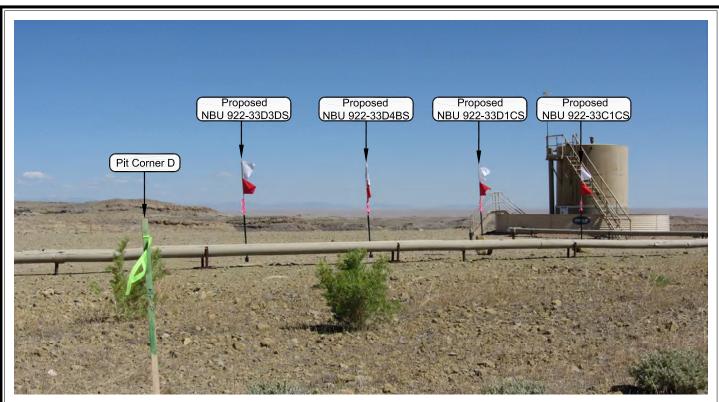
PHOTO VIEW: FROM PIT CORNER D TO LOCATION STAKE
